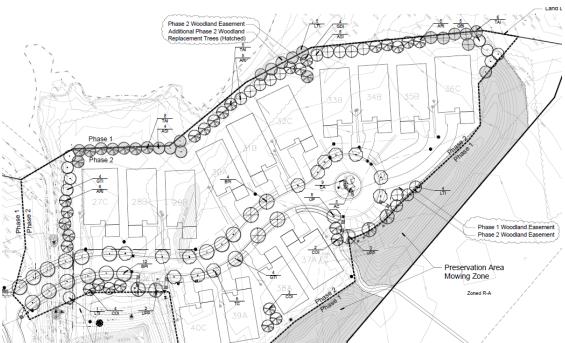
Phase 2 Landscape Plan, June 1, 2021
